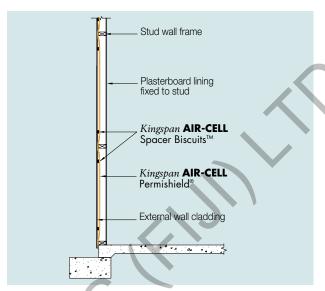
Side elevation of Kingspan AIR-CELL Permishield® on steel-framed wall
